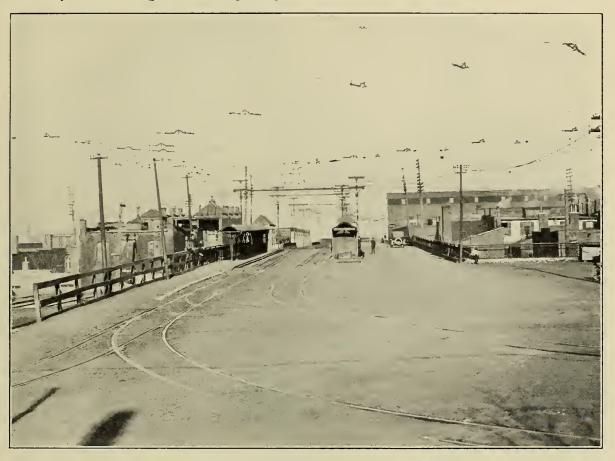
West Entrance to McKinley Bridge, Ninth and Salisbury Streets.
